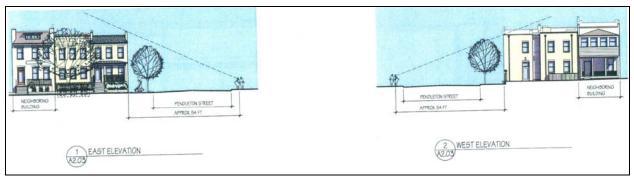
Sight line of HVAC equipment across Pendleton Street.
